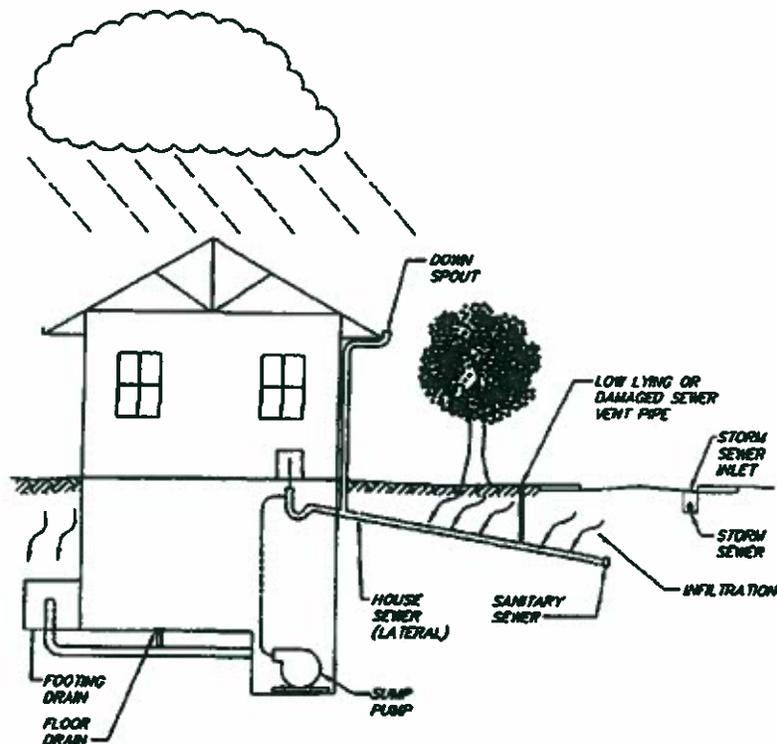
Sources of Inflow and Infiltration through illegal sewer connections
